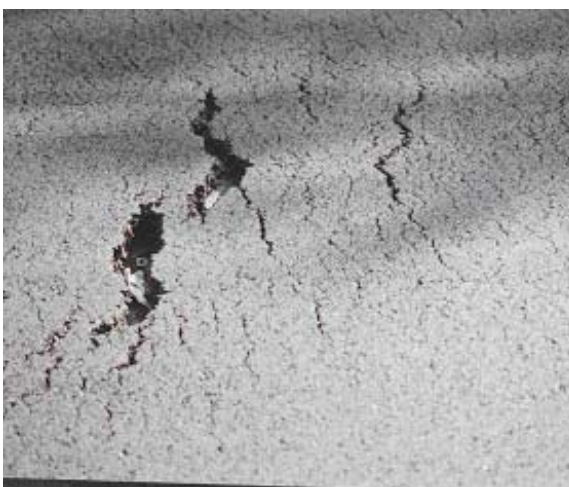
shows pavement deformation in the wheel paths (rutting) due to inadequate compaction. Picture 2 shows “checking” cracking in a newly constructed pavement due to problems with the production of the asphalt material, as well as, excessive compaction during construction.
